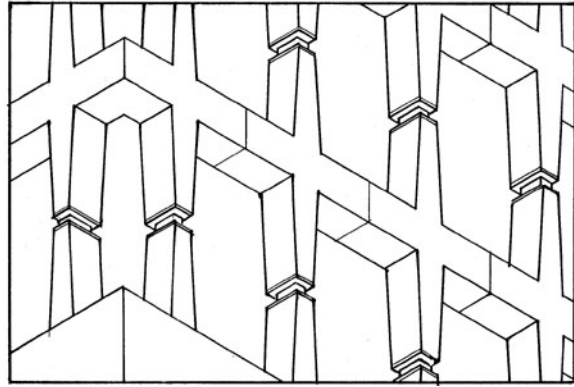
Precast structural cross; installation joints are at sections where bending is minimum during high seismic demand.
